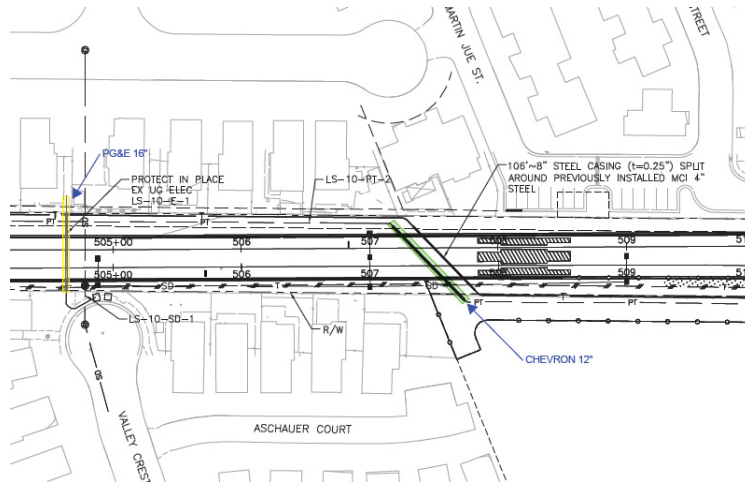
Chevron 8-inch/12-inch Casing Plan
